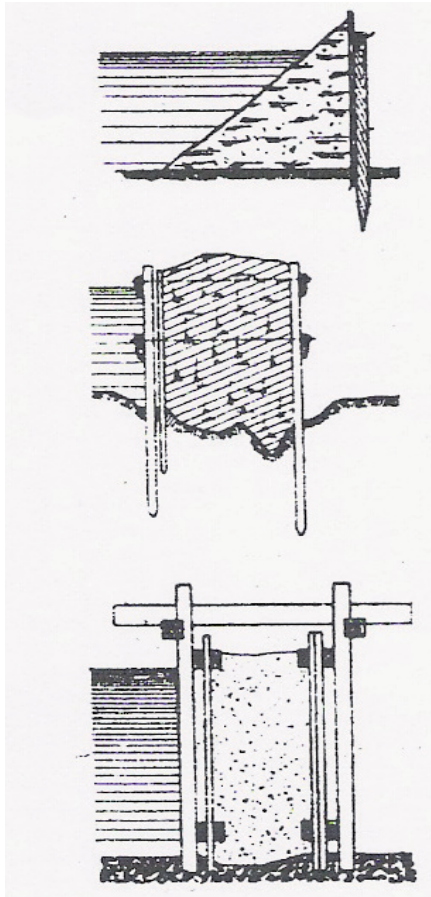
Cross-sections of early Roman wooden retaining wall structures 100 BC [Leimdorfer 1976]
